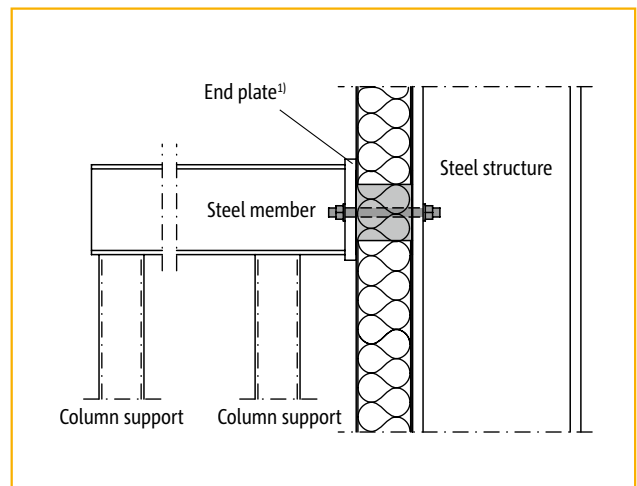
Schöck Isokorb® KST-ZST module for restrained steel structures
